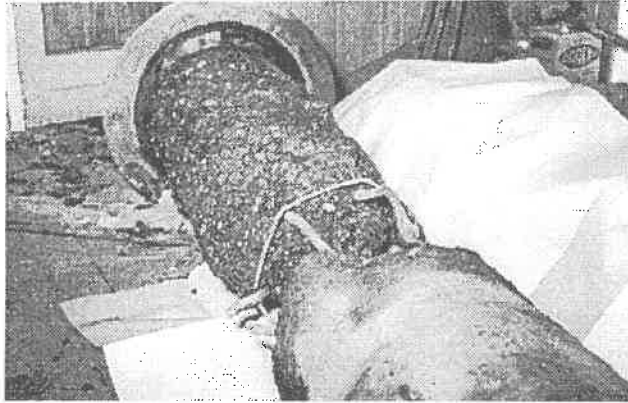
Lower part of pile from fig. 3. Note gravelly concrete in combination with too slender pile section. Upper part arches on mounting ring (not visible). Section of pile, that failed, is shown. Pile has been cleaned and loose parts were removed.
